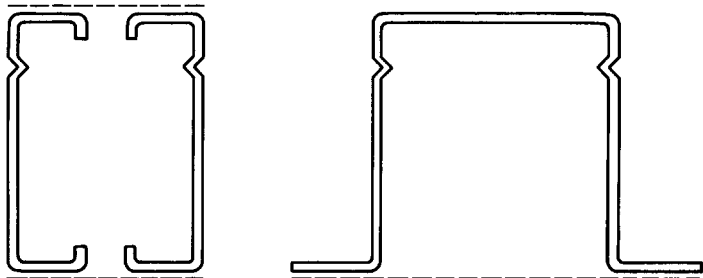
Typical sections for longitudinally reinforced beam specimens.
